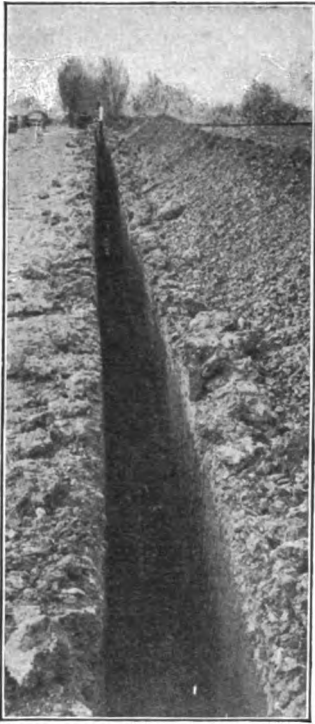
A four foot ditch cut in heavy clay soil on the University farm by the steam ditching machine shown in figure 207.
